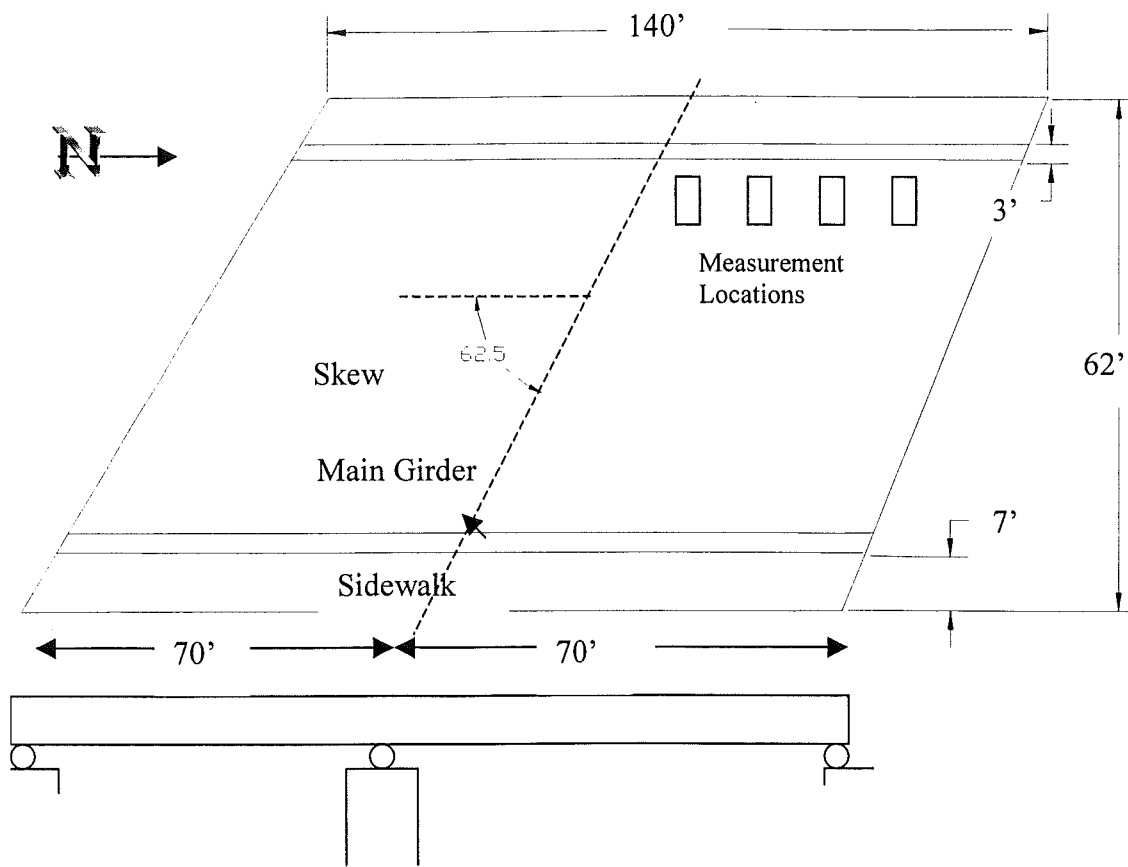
Plan and Cross-Section of Scotten over Michigan (B1)
